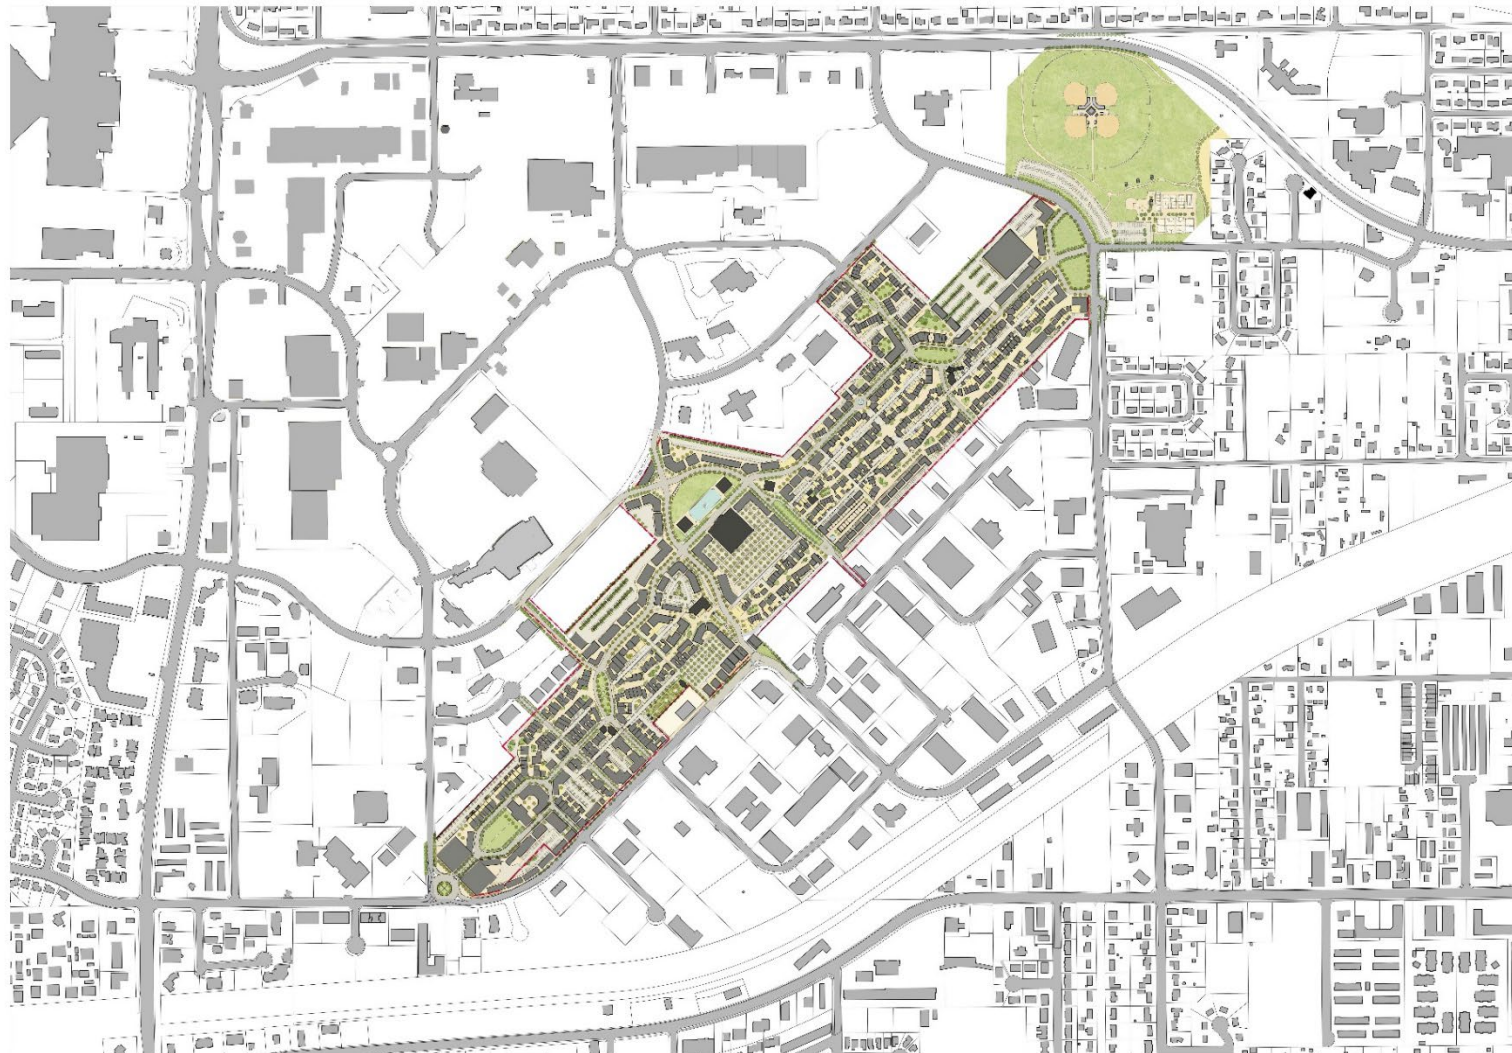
EXHIBIT C – VISTA FIELD MASTER PLAN 2017
